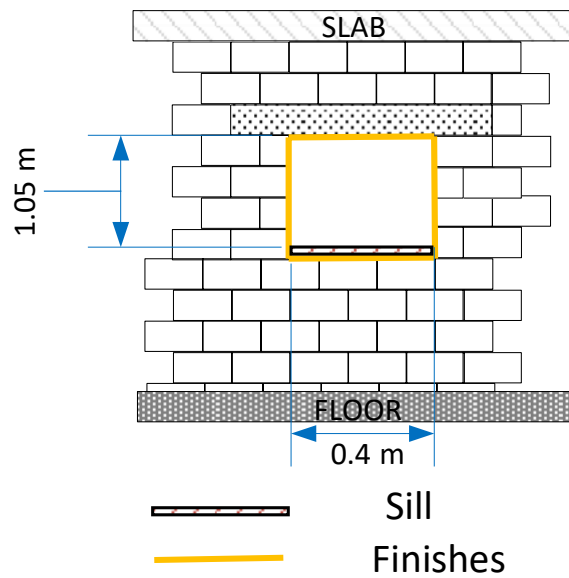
Indicates the minimum Construction opening Width and Construction opening height for Internal and External Window Apertures
